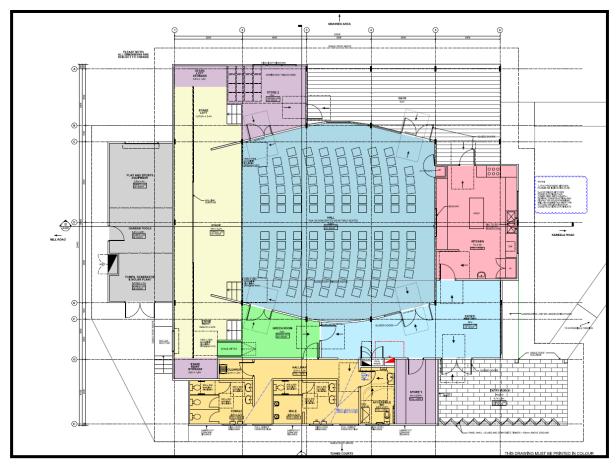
Proposed Floor Plan (Source: PSA Architects)
